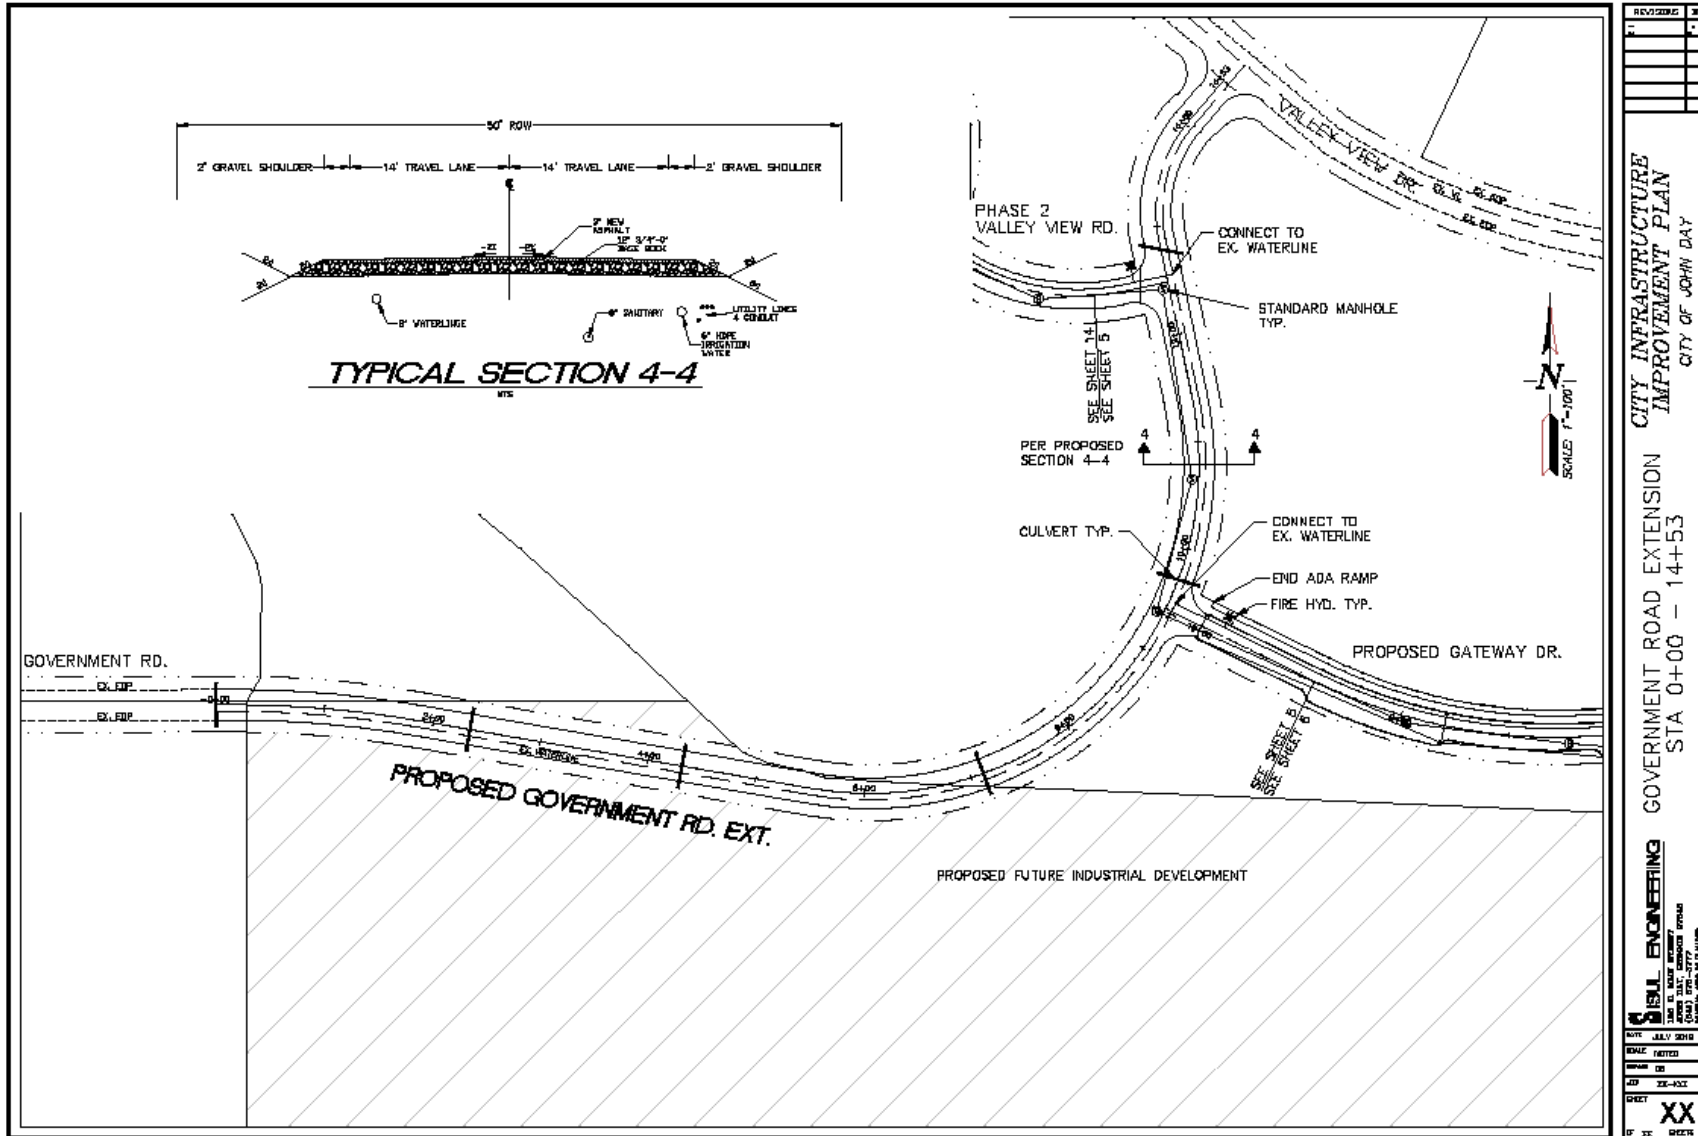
Exhibit B. Government Entry Road and Gateway Drive Project Right of Way
